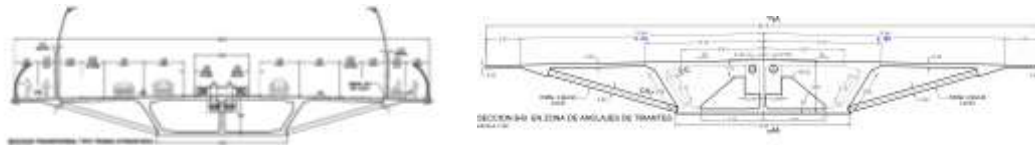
Functional and structural cross sections of the cable-stayed stretch.
